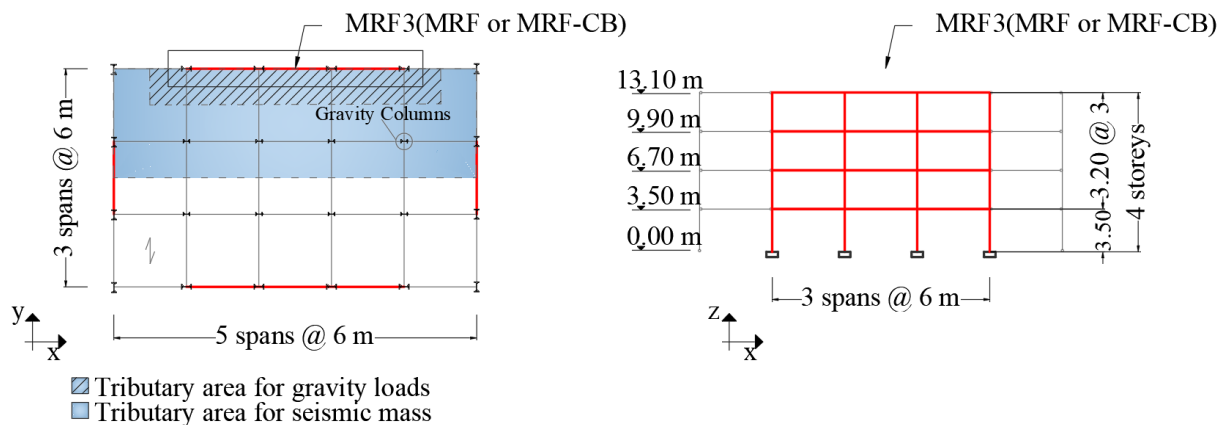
Case study building (*i.e.*, MRF3 of Figure 4.1): (a) Plan view; (b) Elevation view.
